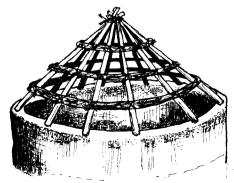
BUILDING OF THE SUB-STRUCTURE OF A CO-NICAL THATCH ROOF
